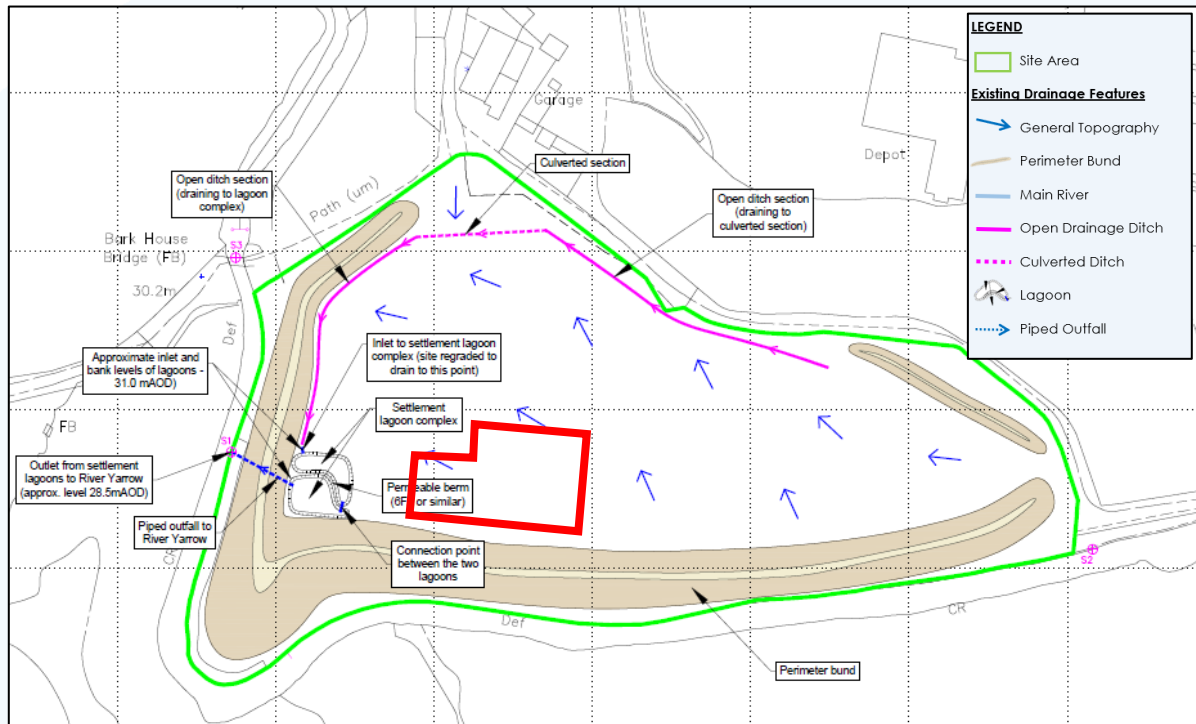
Existing Drainage Plan Extract (Oaktree Environmental Ltd, 2020)
